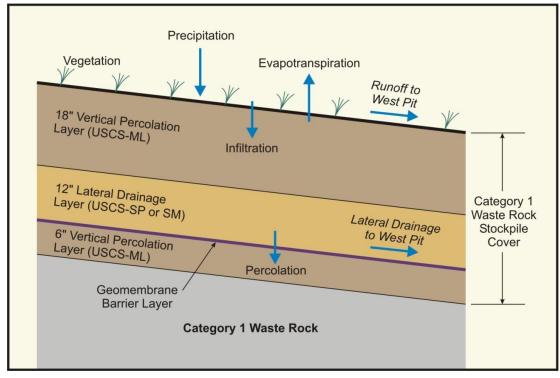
Conceptual Cross-Section: Category 1 Waste Rock Stockpile Cover System
